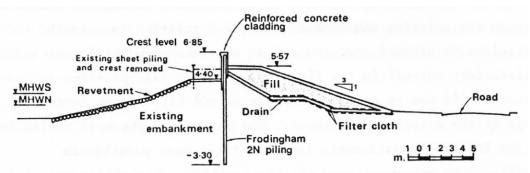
Raised dike using a sheet piling and fill (Gudgeon and Hannah, 1983)
